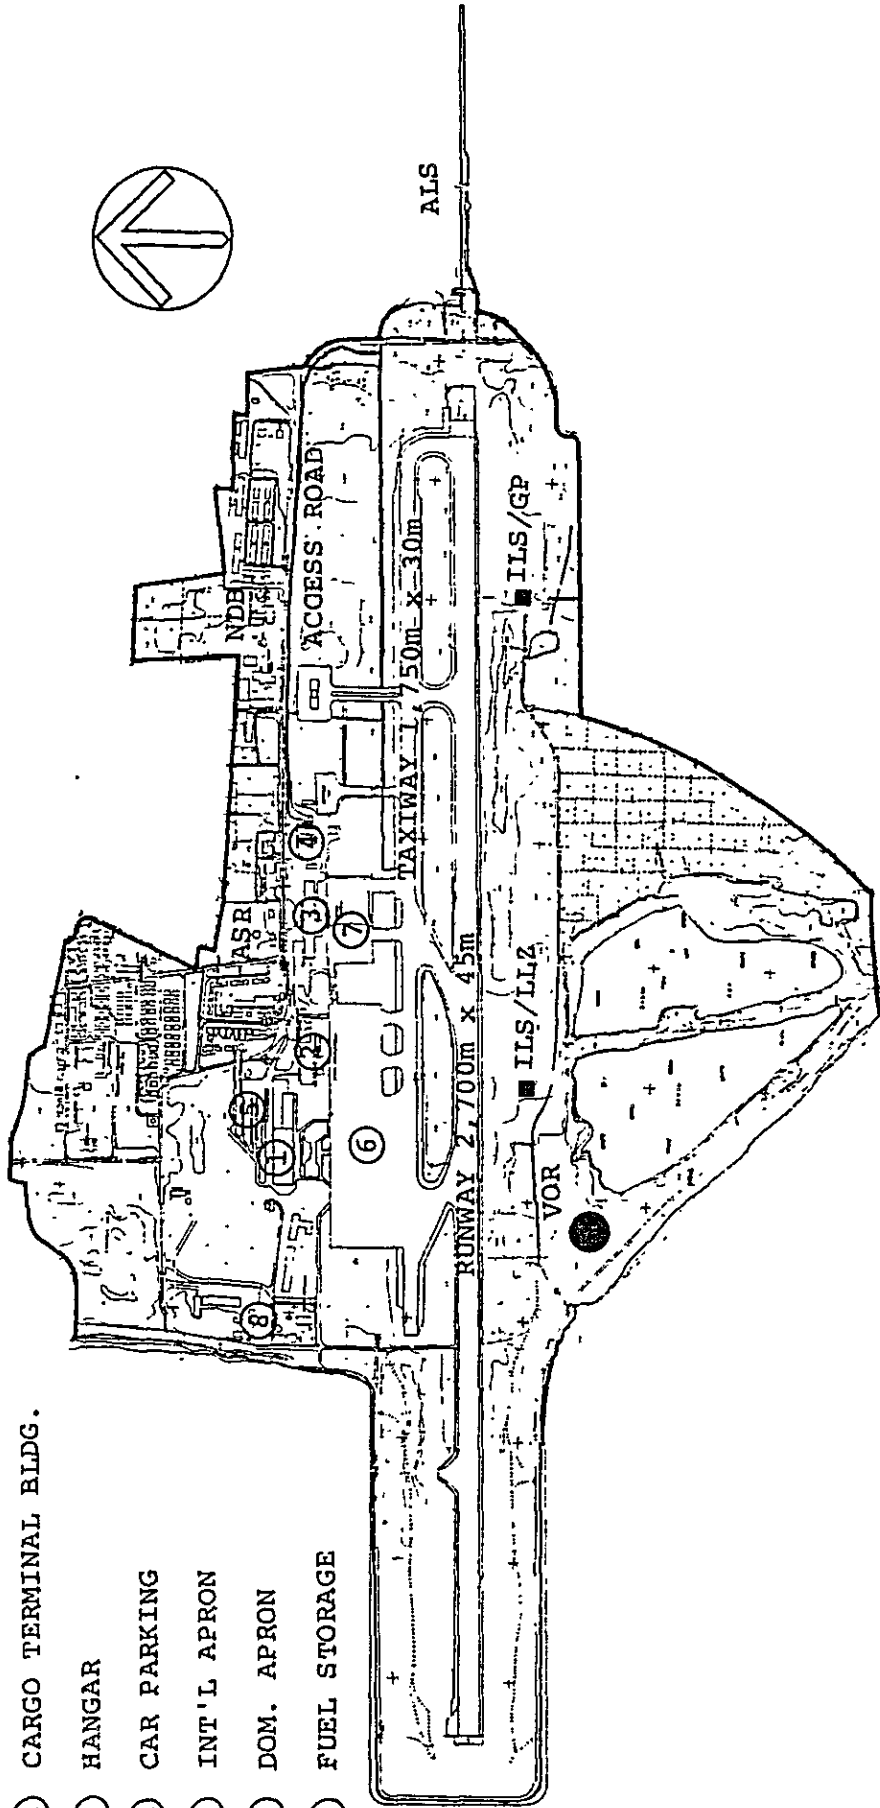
General Layout Plan of Existing Airport Facilities (1981)
